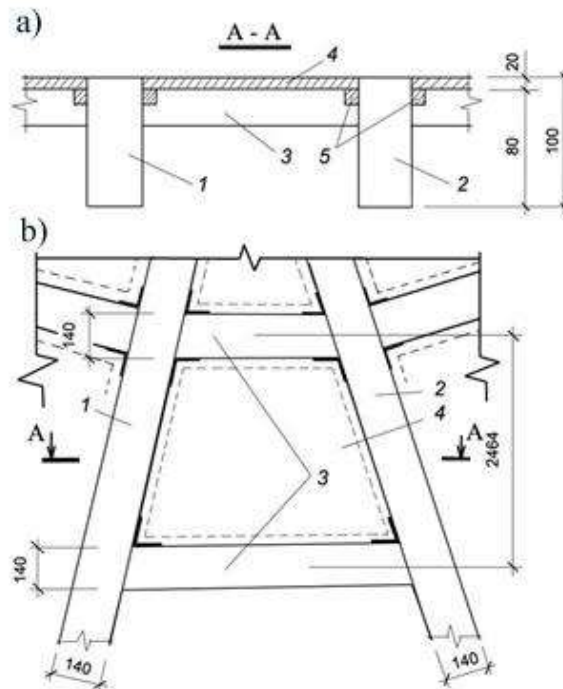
Scheme of plates on the dome frame: a) section; b) plan.
